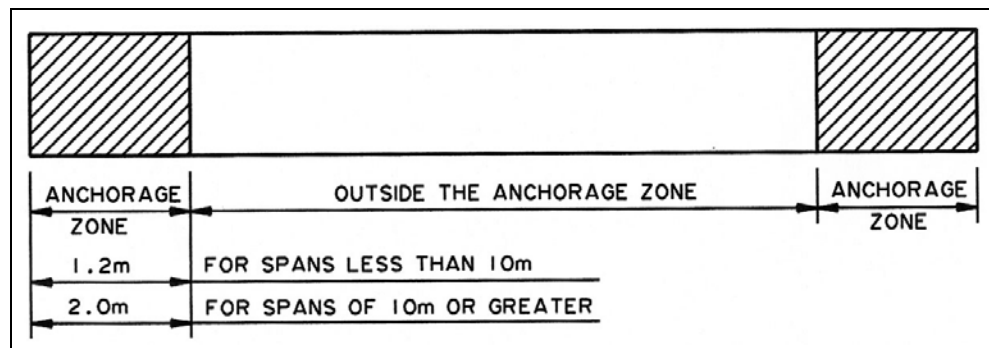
Standard Channel Girder – Anchorage Zone
